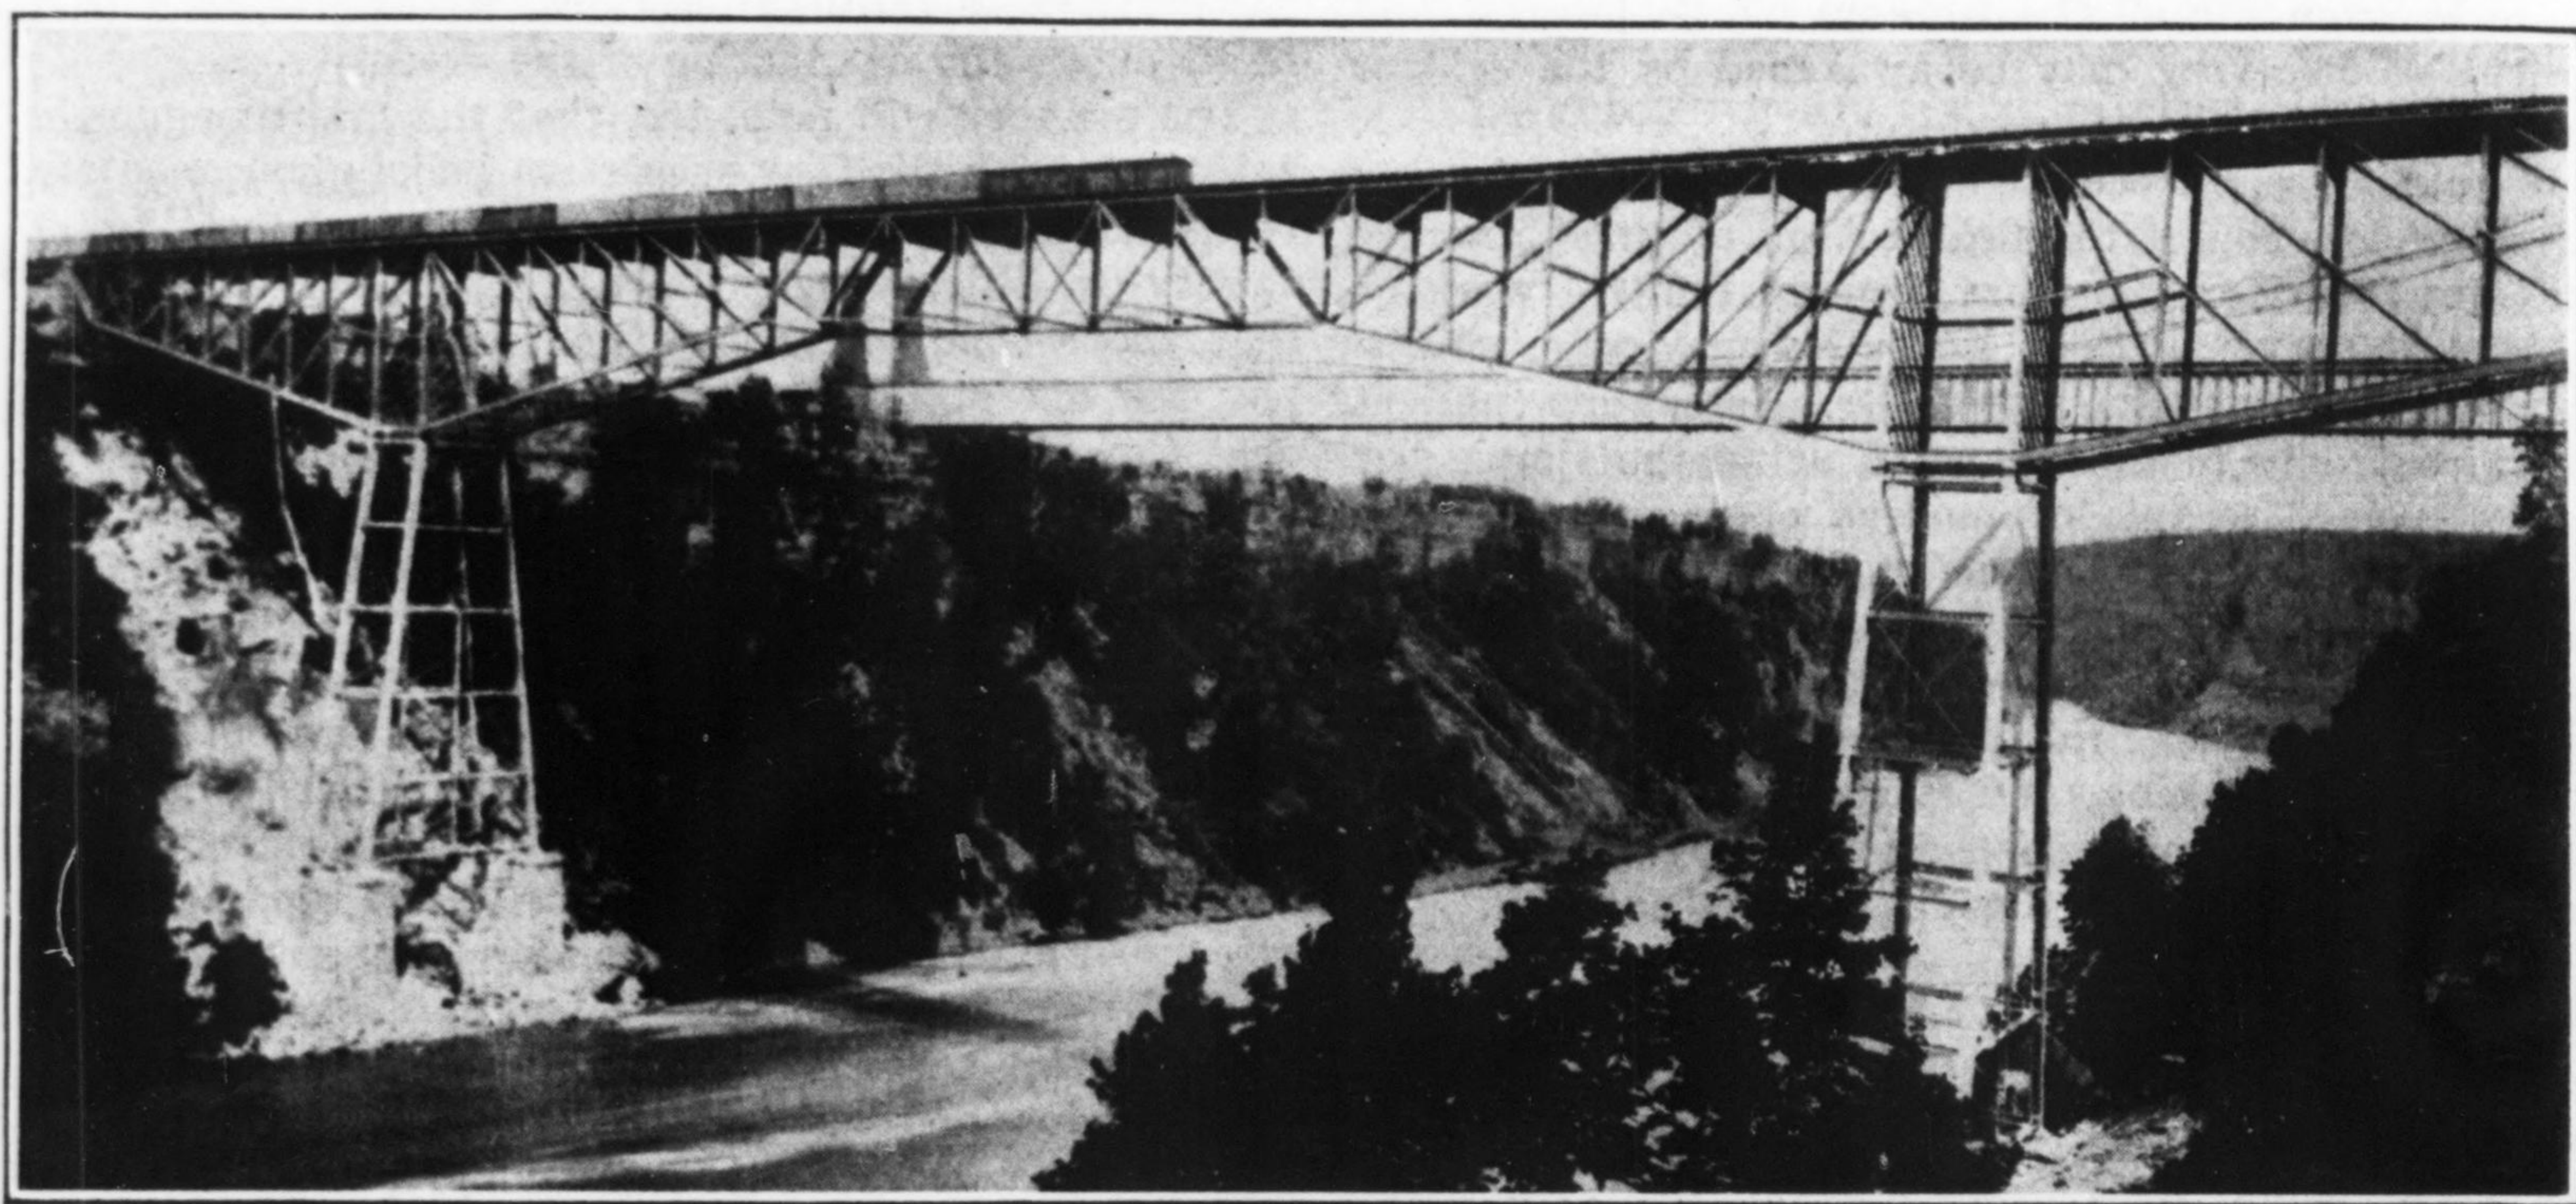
NIAGARA CANTILEVER BRIDGE AS ORIGINALLY BUILT
